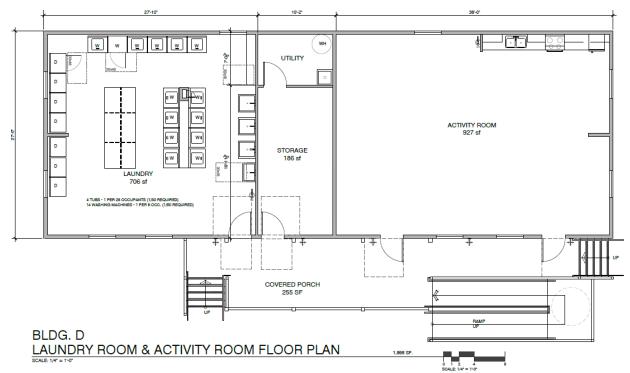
Laundry, Activity and Storage Room Floor Plan
